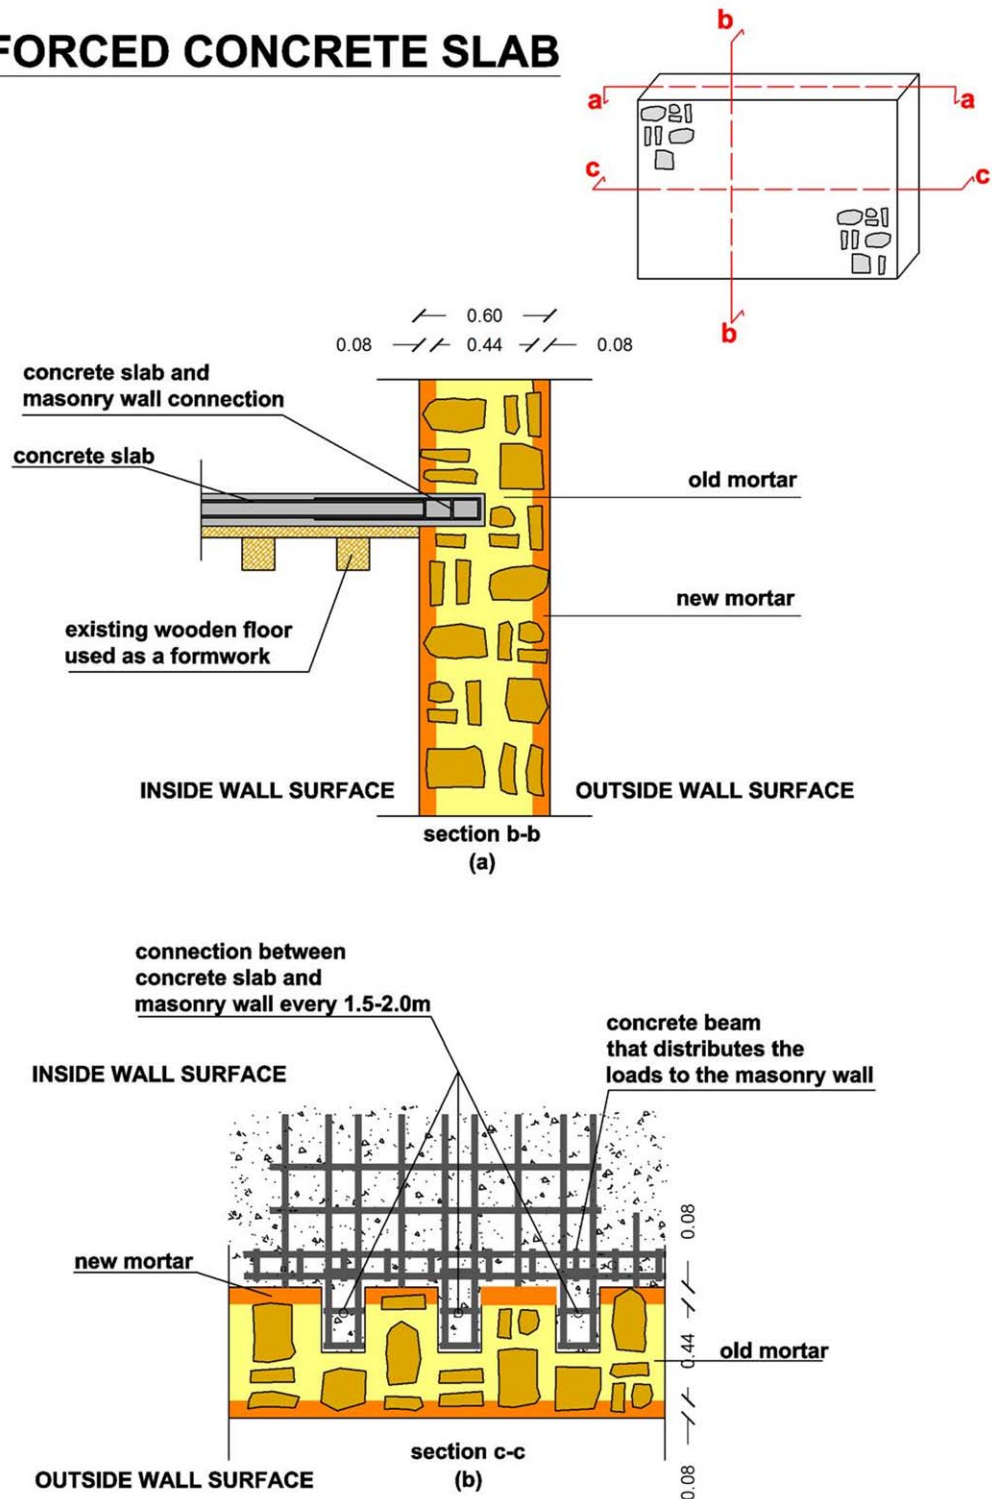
Slab R.C.at the levels of the basement and ground floor slabs
